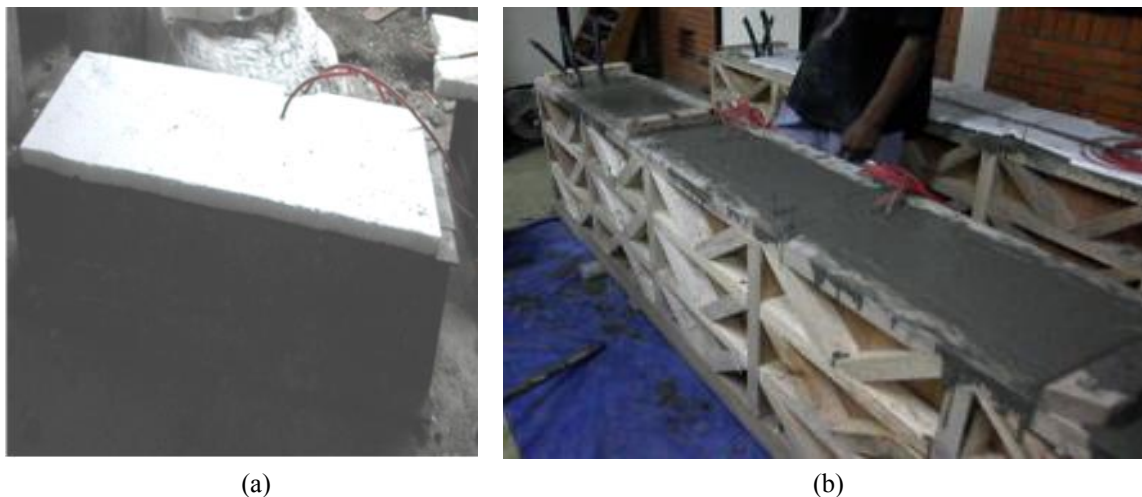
Styrofoam were covered specimen: (a) Laboratory size specimen, (b) full scale specimen
